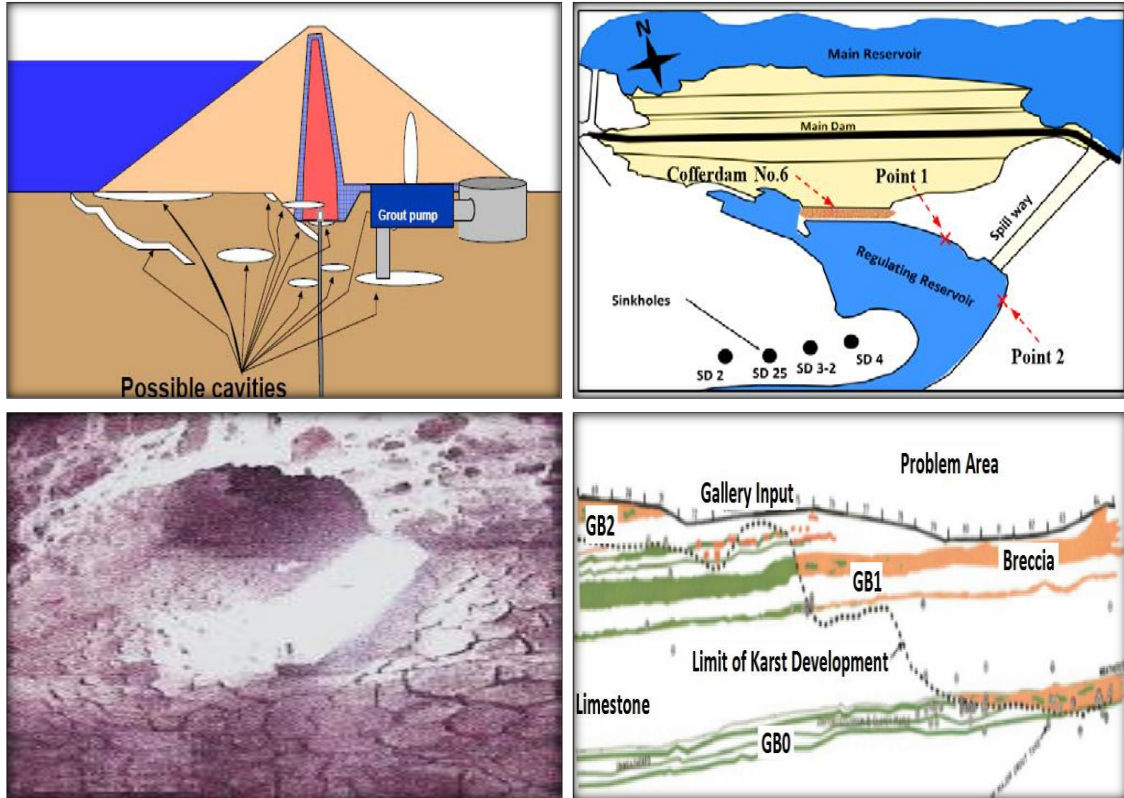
Detail of Mosul Dam, Sinkholes and Cutoff Utilization with Grouting.
